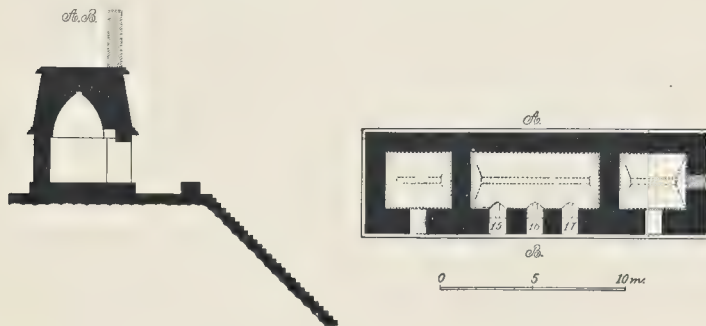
STRUCTURE 21: SECTION AND GROUND-PLAN (RESTORED).
